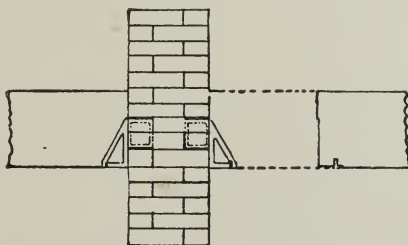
Beam Anchored to Party-wall with Wall-hangers.
